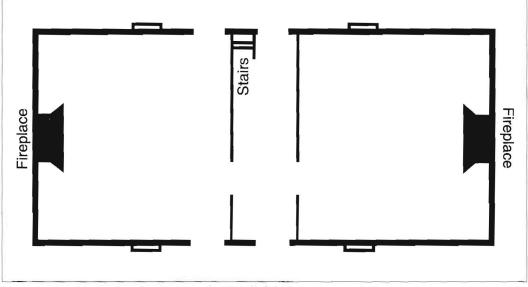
Basic I-house floorplan. (Drawing by Melanie Cabak)
